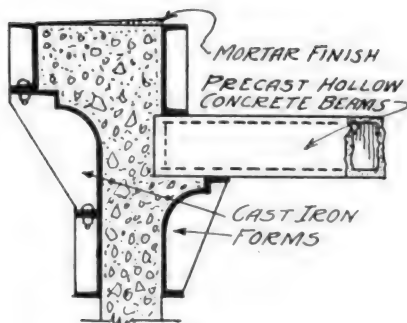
DETAIL OF ROOF CONSTRUCTION
